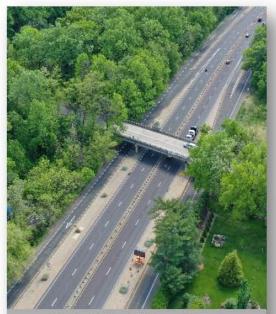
Aerial View of West Interchange Road Overpass (Looking South)
